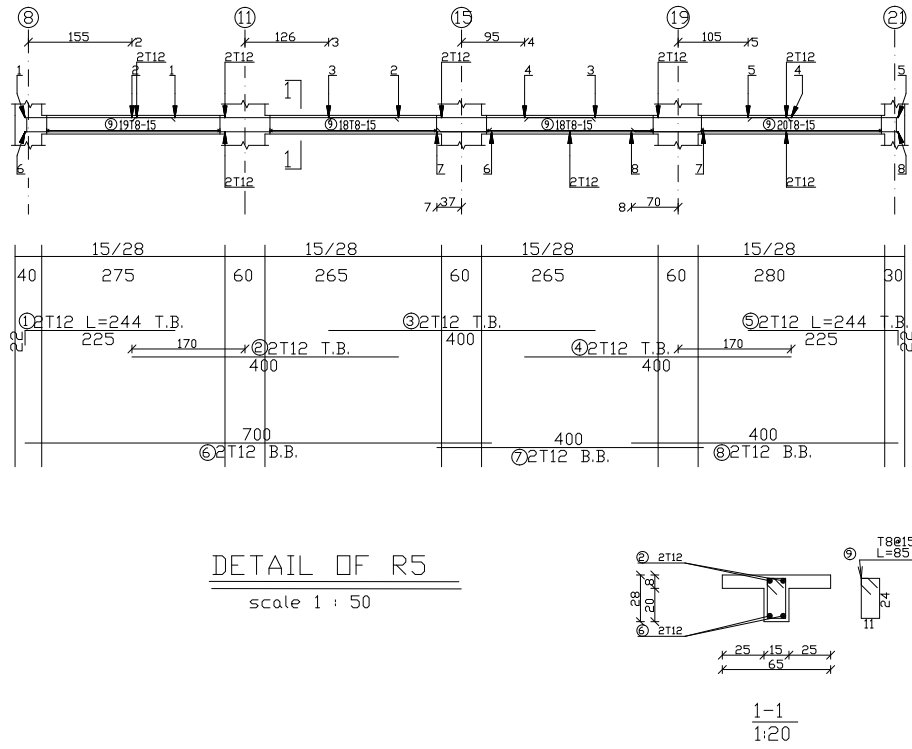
Plan View and Section in a One-Way Ribbed Slab
